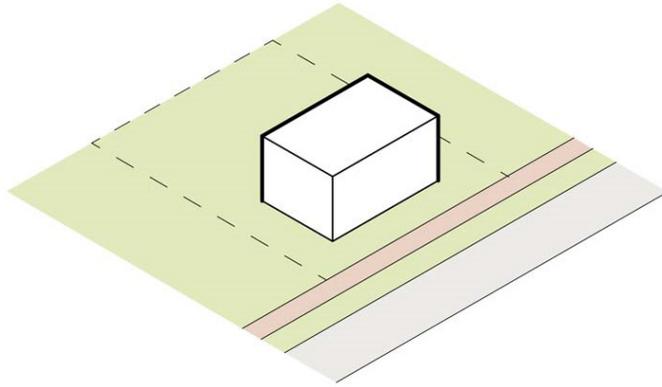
Chestertown, MD - Setbacks and Massing, Source – Author, 2014
